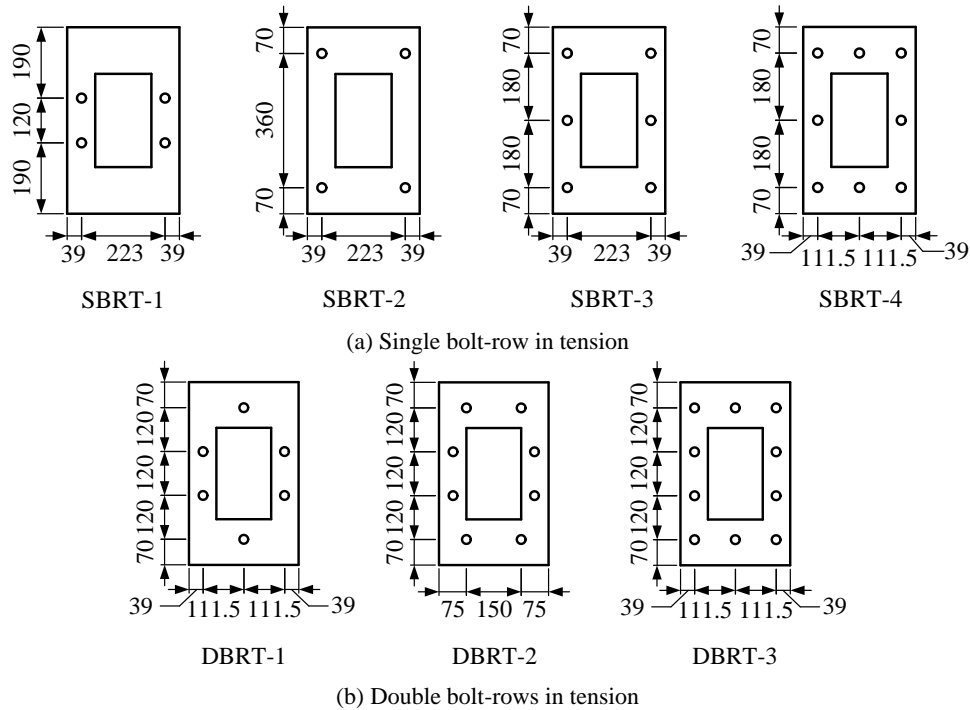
Layout of blind bolts on end-plate (Unit: mm)
